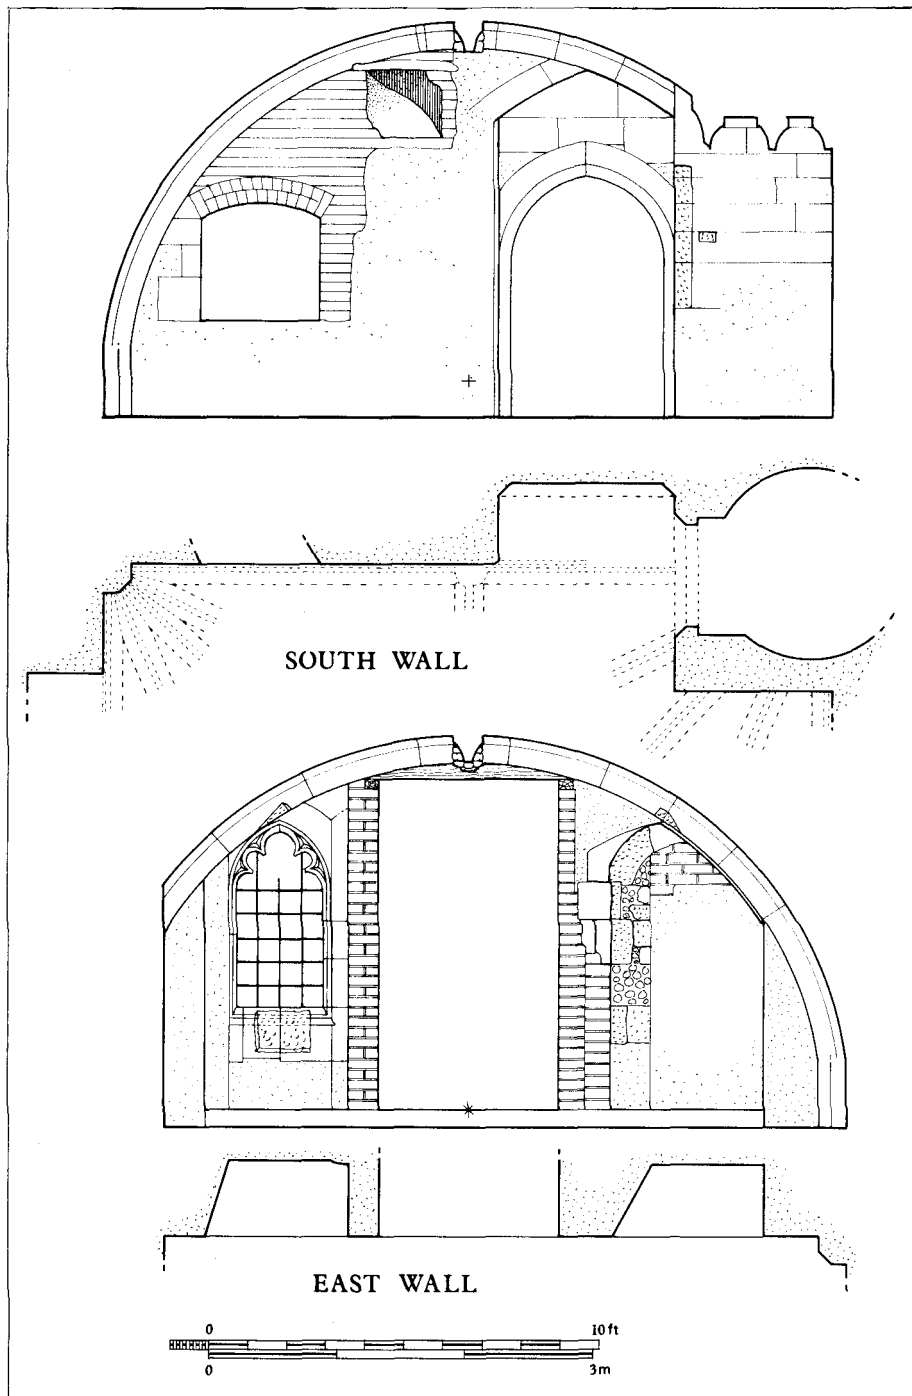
Westminster Abbey. Redevelopment of 20 Dean's Yard 1975-77. Elevations of the south and east walls of the hallway
